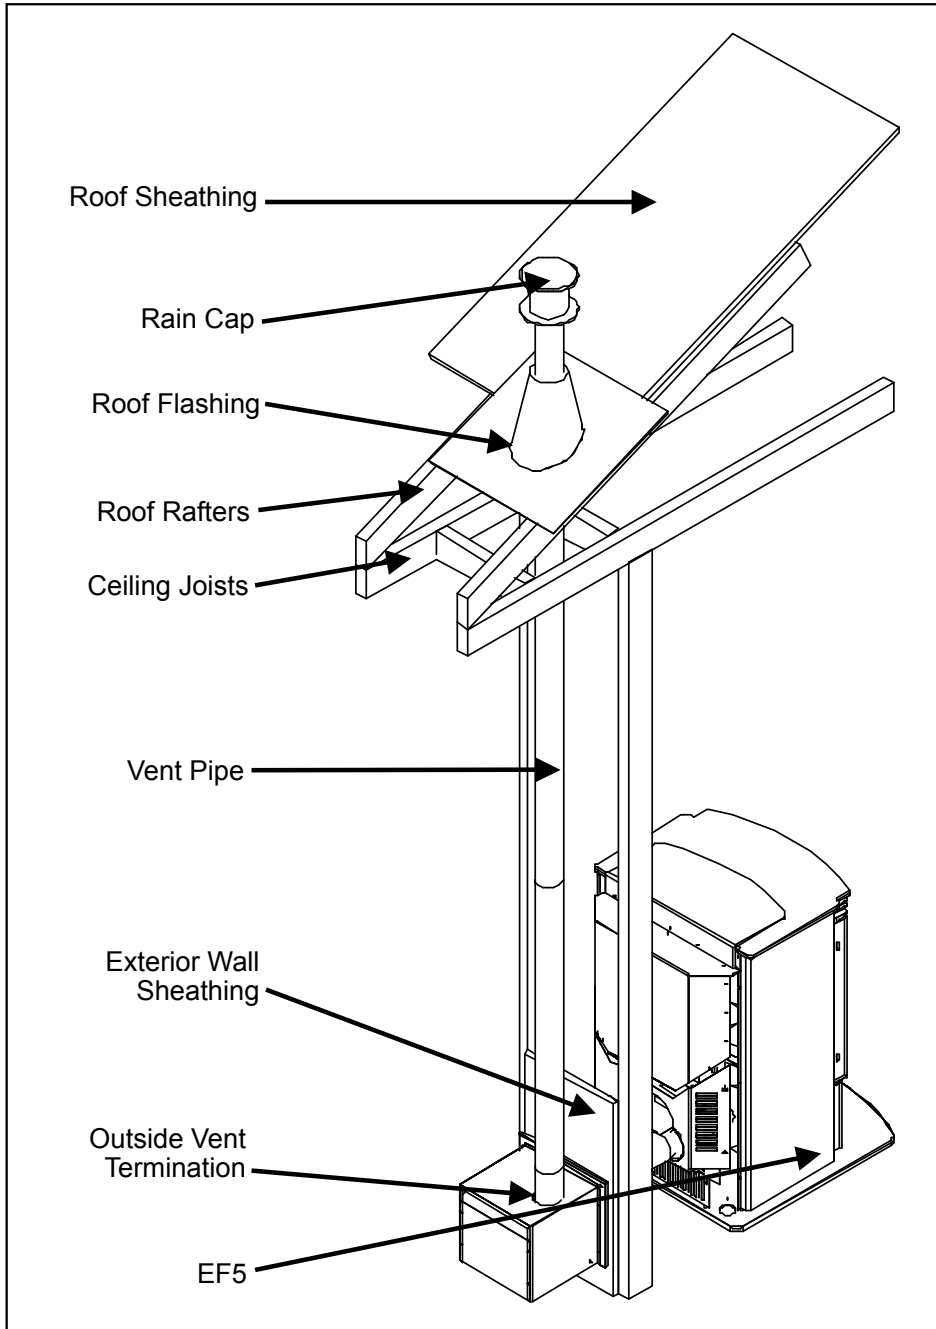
Through Wall Installation with Exterior Blower Kit; Vertical Termination.
